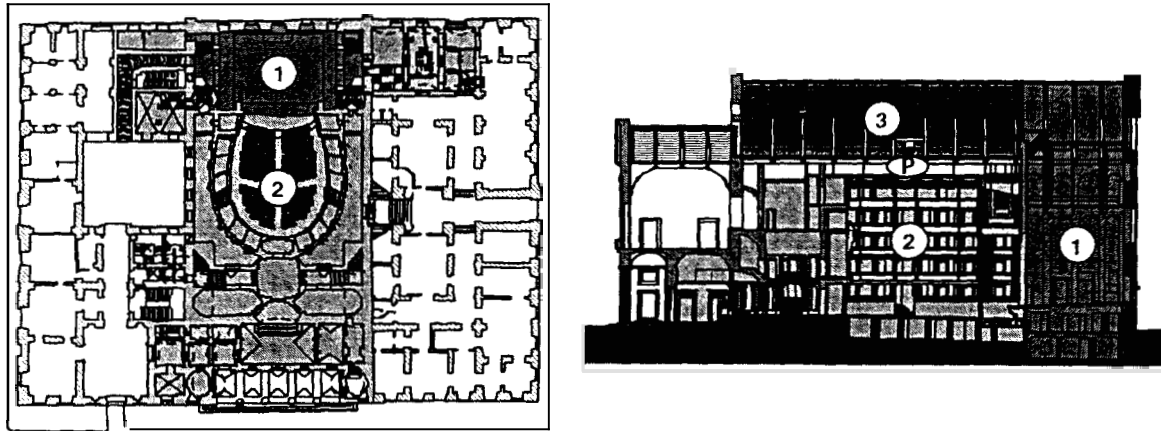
Theater's plan and section - 1,2,3: fire compartments - P: plafond zone
